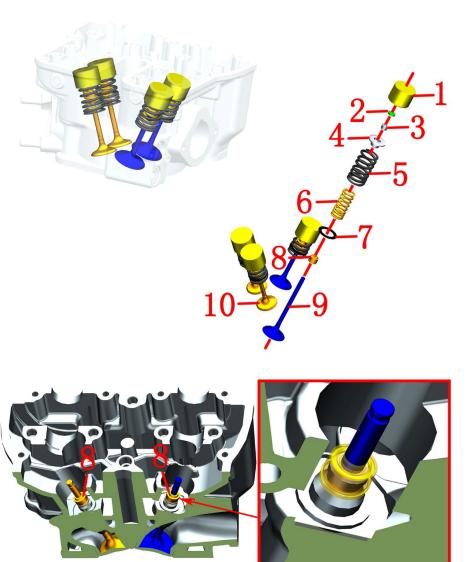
CYLINDER HEAD	valve assembly	СНК	(0)
